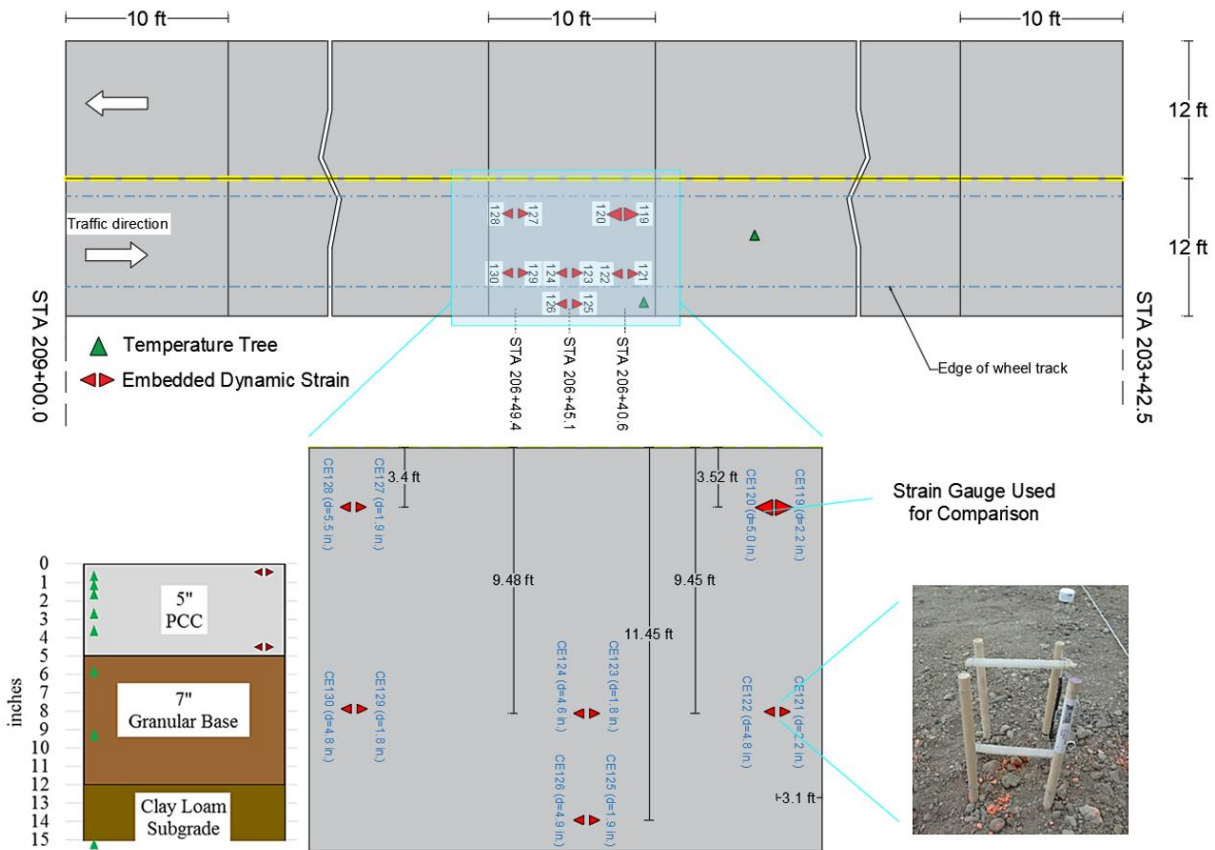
MnROAD Cell 32 section and sensor layout (modified from Burnham 2002).
